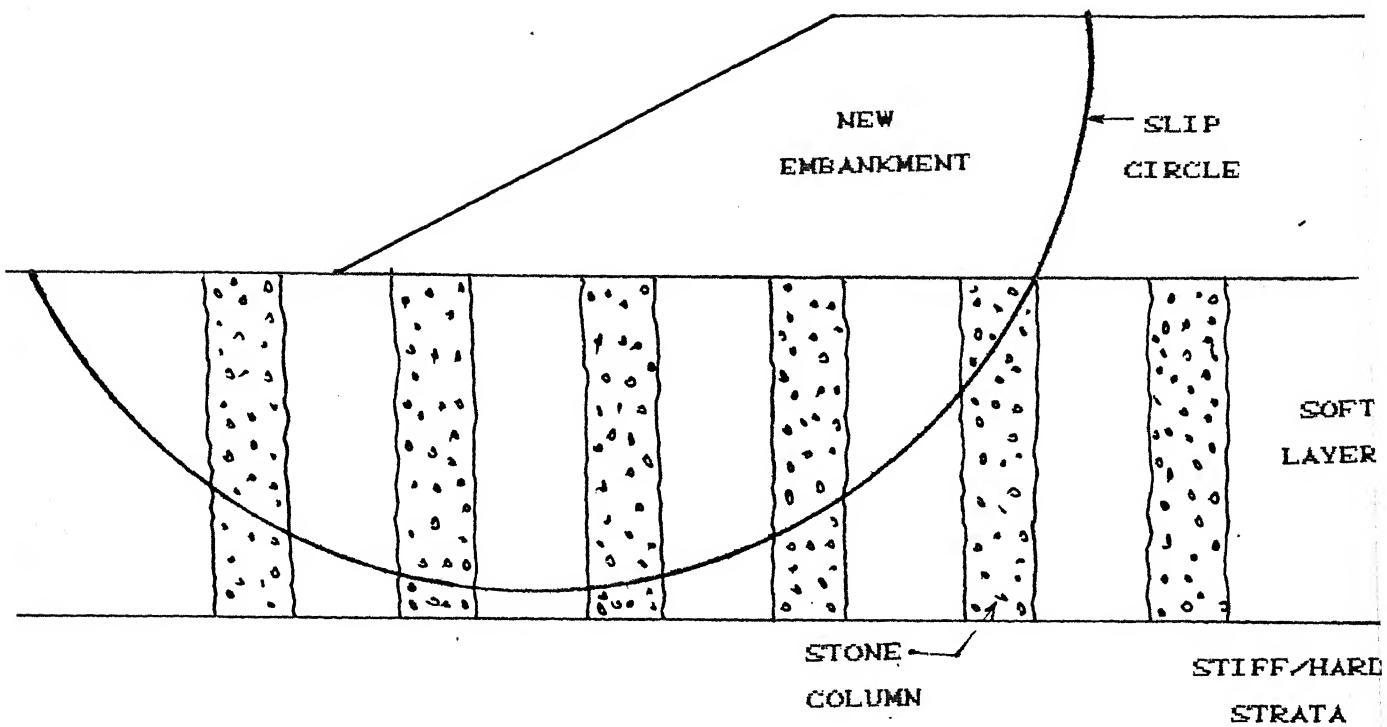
EMBANKMENT FOUNDED ON STONE COLUMN REINFORCED GROUND
